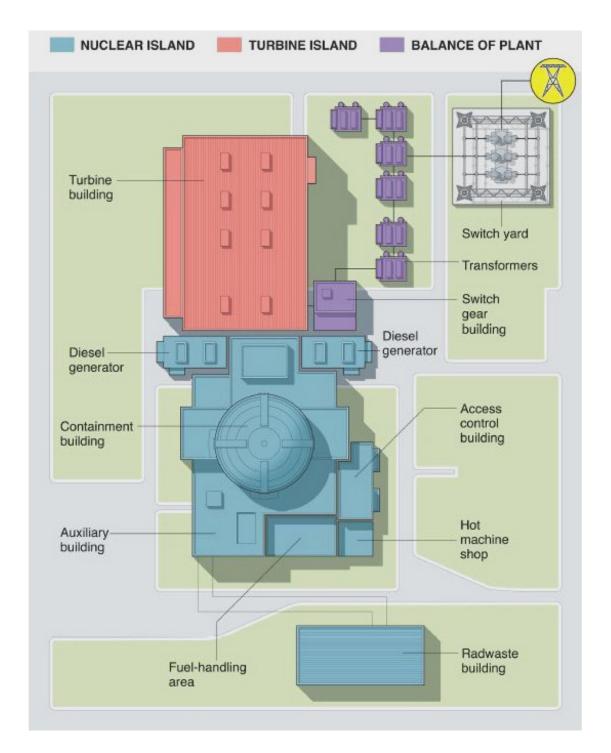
Site plan of a PWR nuclear power plant. The site is divided into three sections, nuclear island, turbine island, and balance of plant buildings [10].
